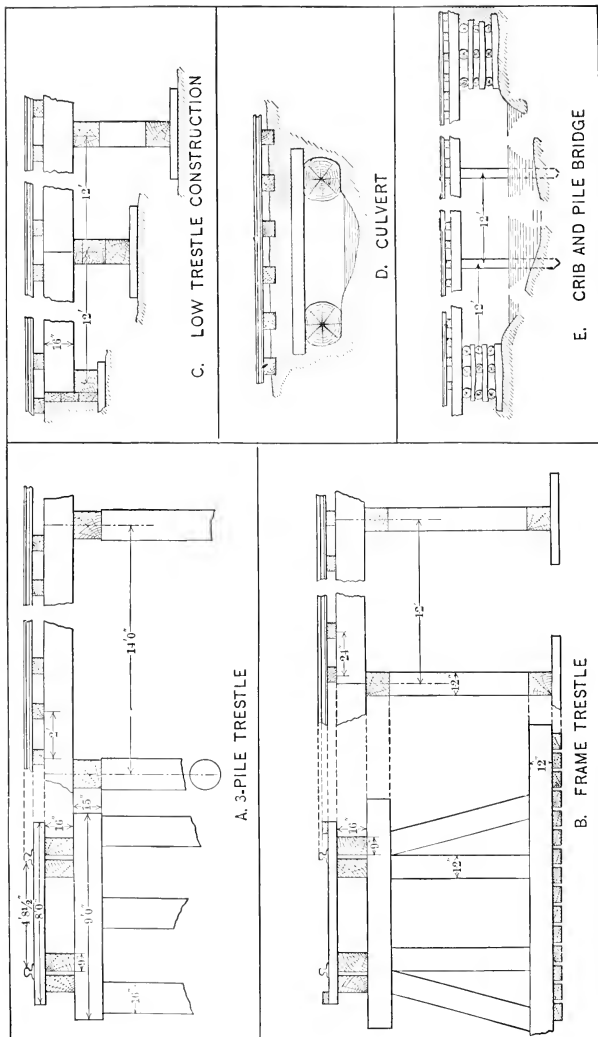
Forms of Trestles and Culverts commonly used on Logging Railroads.
